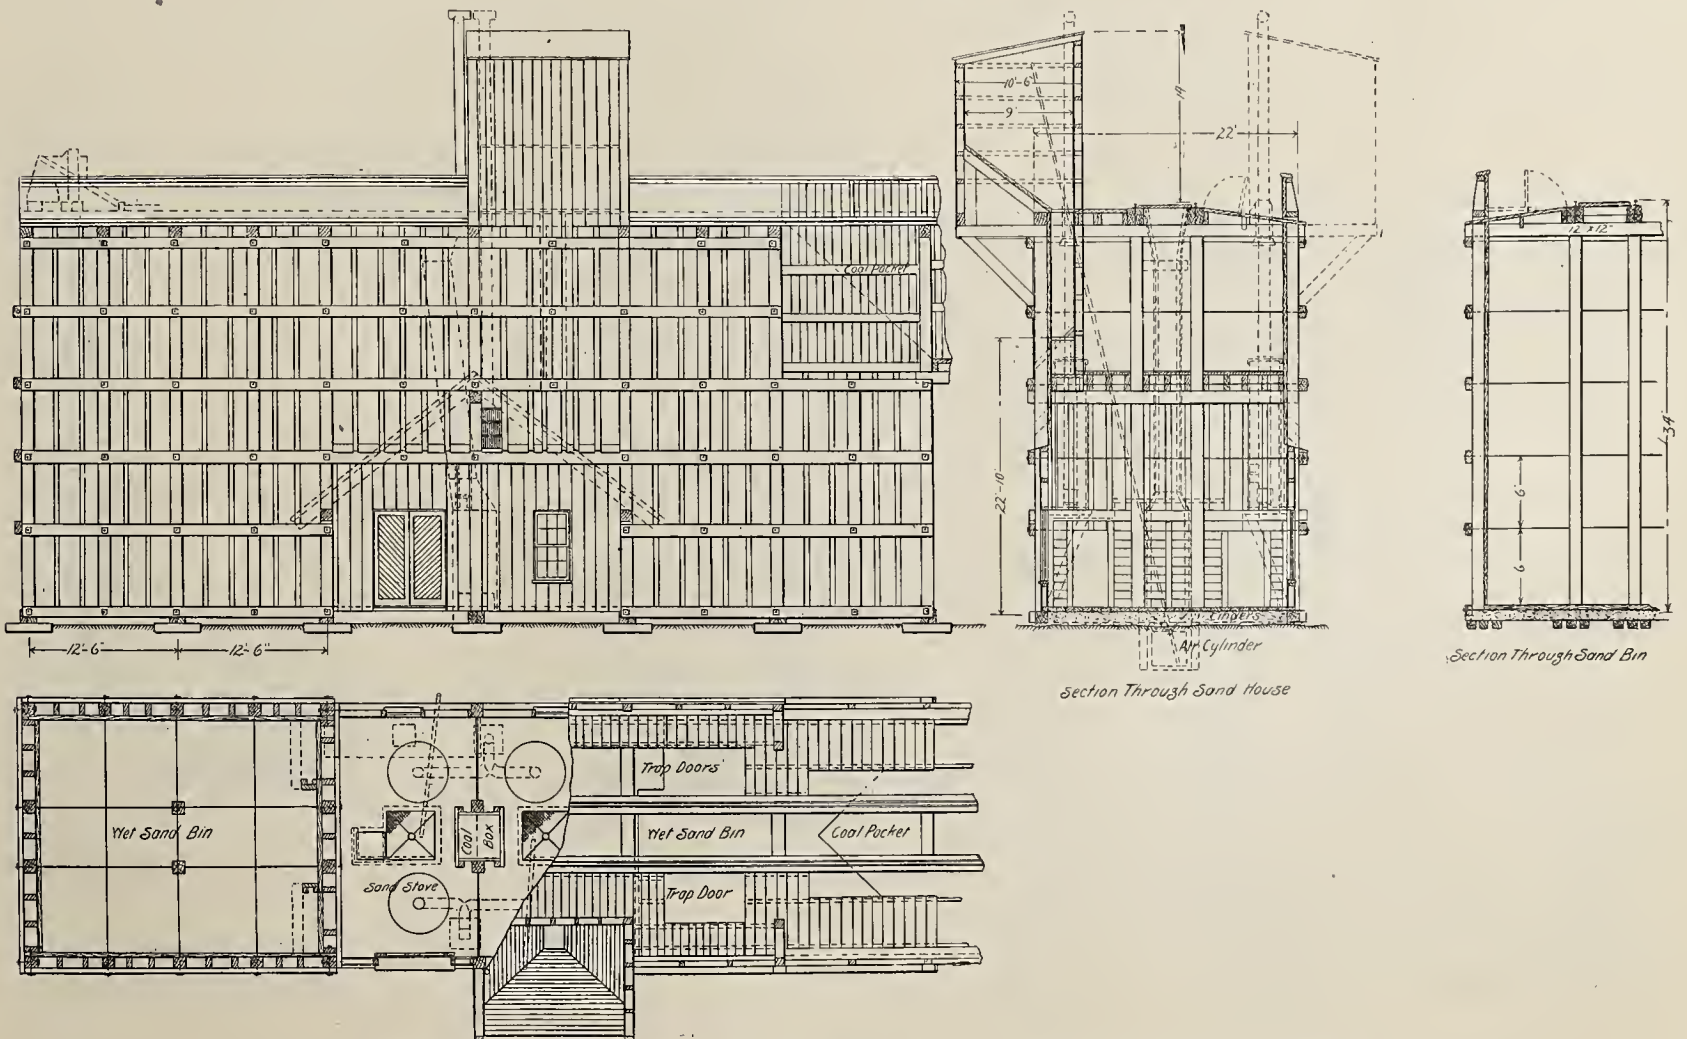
GENERAL ARRANGEMENT OF SAND HOUSE AT COALING STATIONS—B. & O. R. R.
